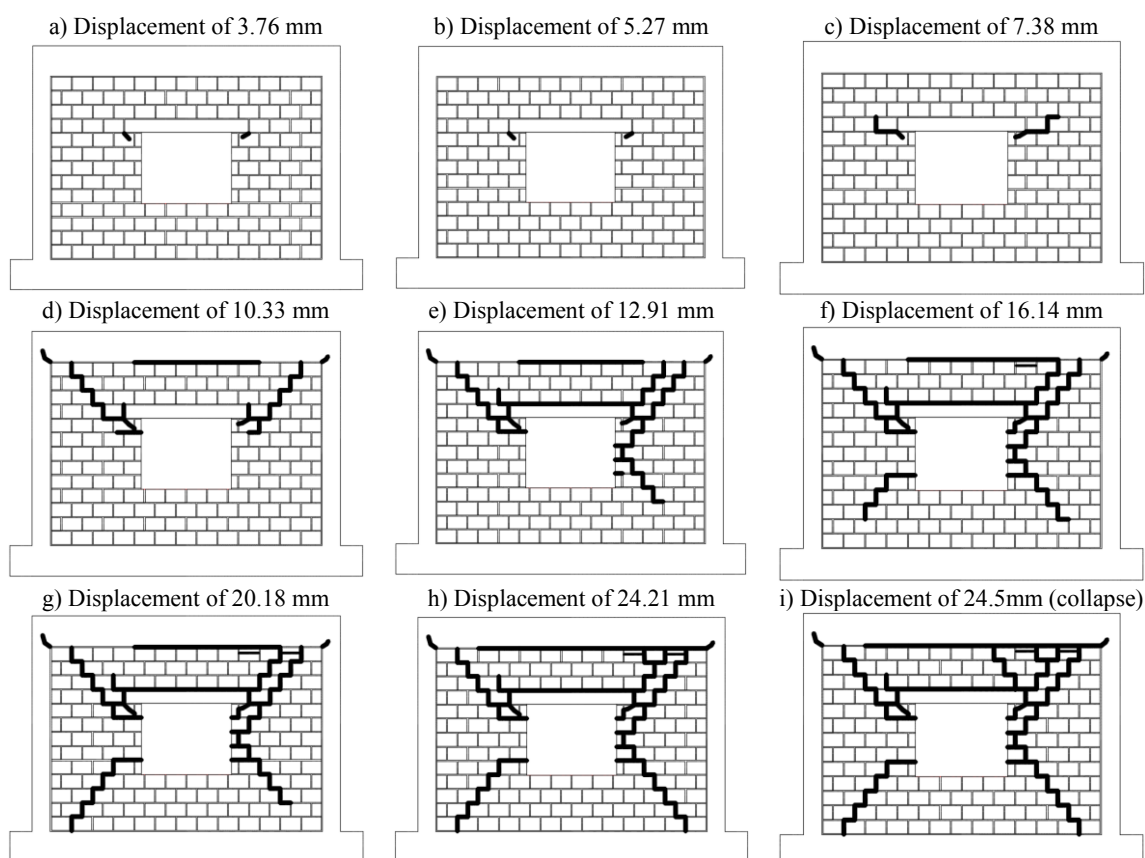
Crack propagation observed in specimen PIF-O-1L-B
